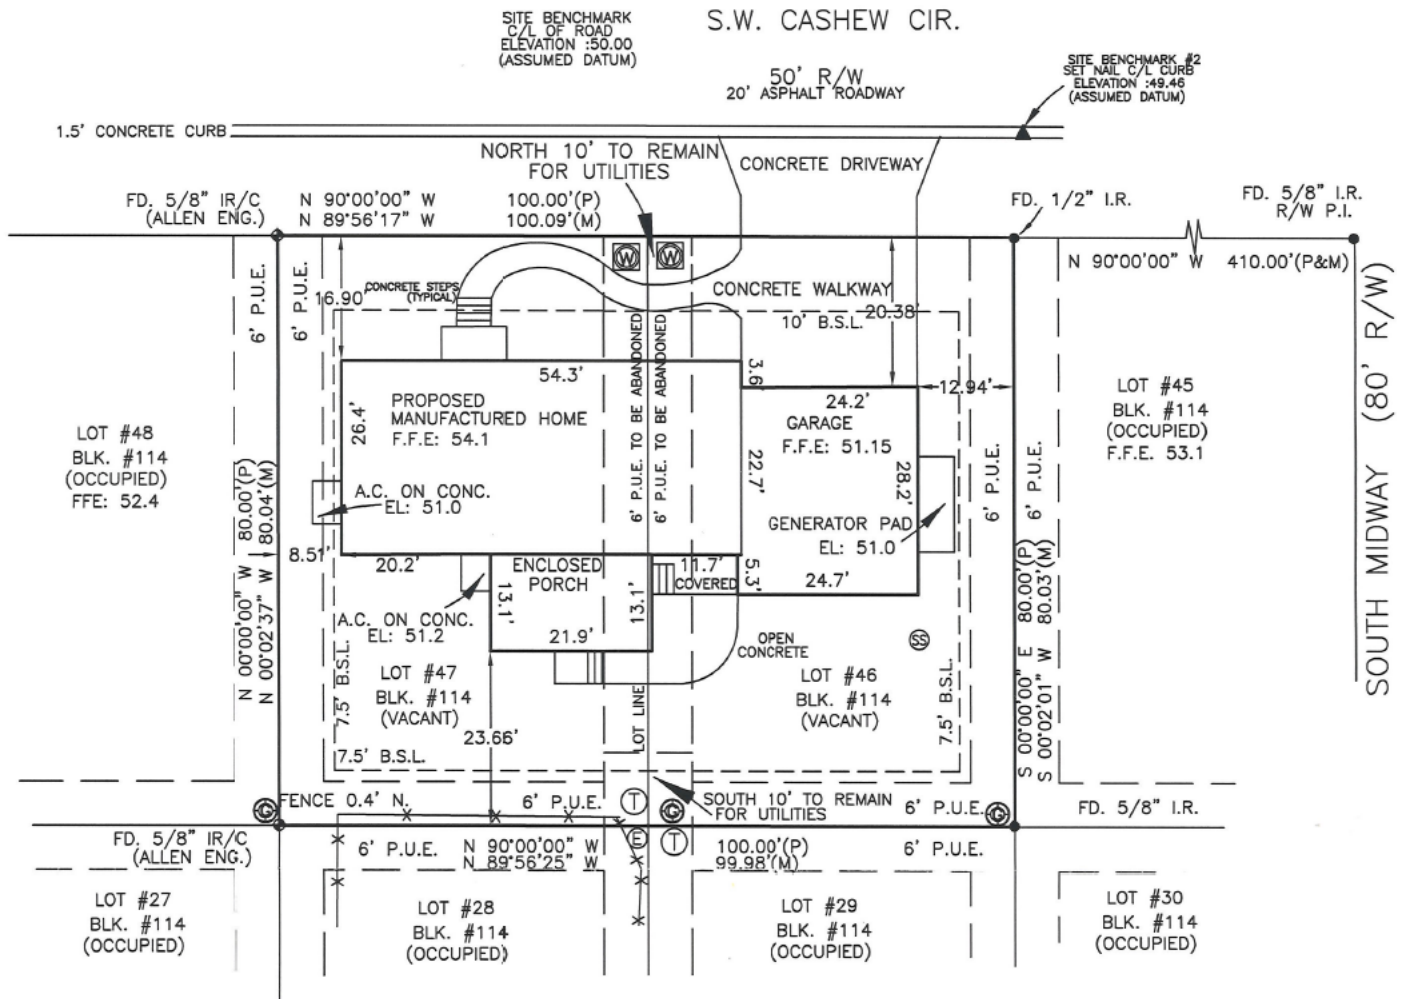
Petitioner's Proposed Plot Plan for new home on lots 46 & 47, Block 114, Barefoot Bay.
